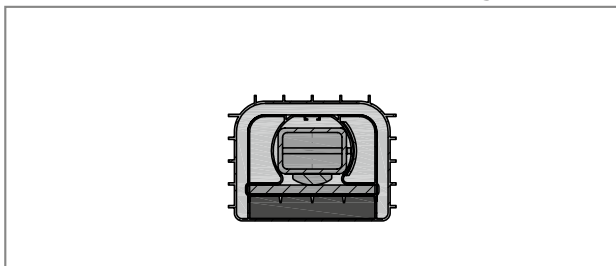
Schöck Tronsole® type Q: Installation variant horizontal installation of the load-bearing element
